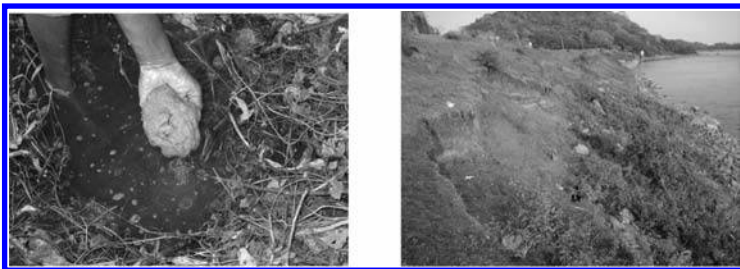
Ageing mechanisms at embankment dams: Sand boiling along the toe of Nachchaduwa dam (left), where extensive water-logged areas are seen when the reservoir is full; Upstream slope instability at Huruluwewa dam due to lack of wave protection (right).
